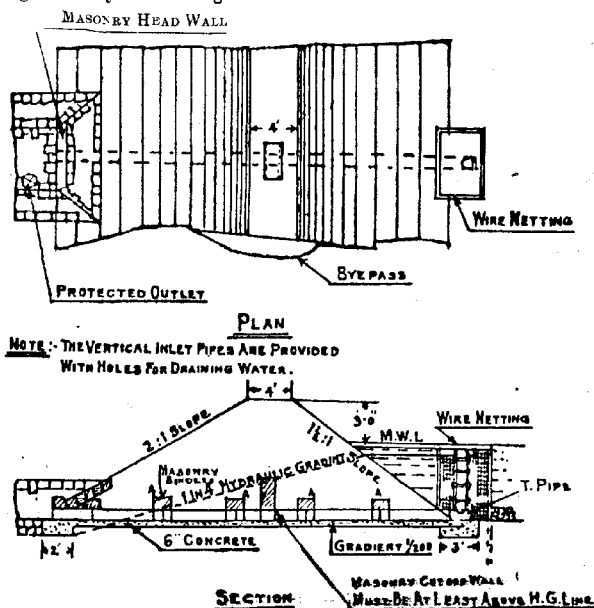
SKETCH OF A CAST IRON OR STONEWARE PIPE DROP INLET CULVERT IN AN EARTHEN DAM (SOCKET AND SPIGOT JOINTS)
